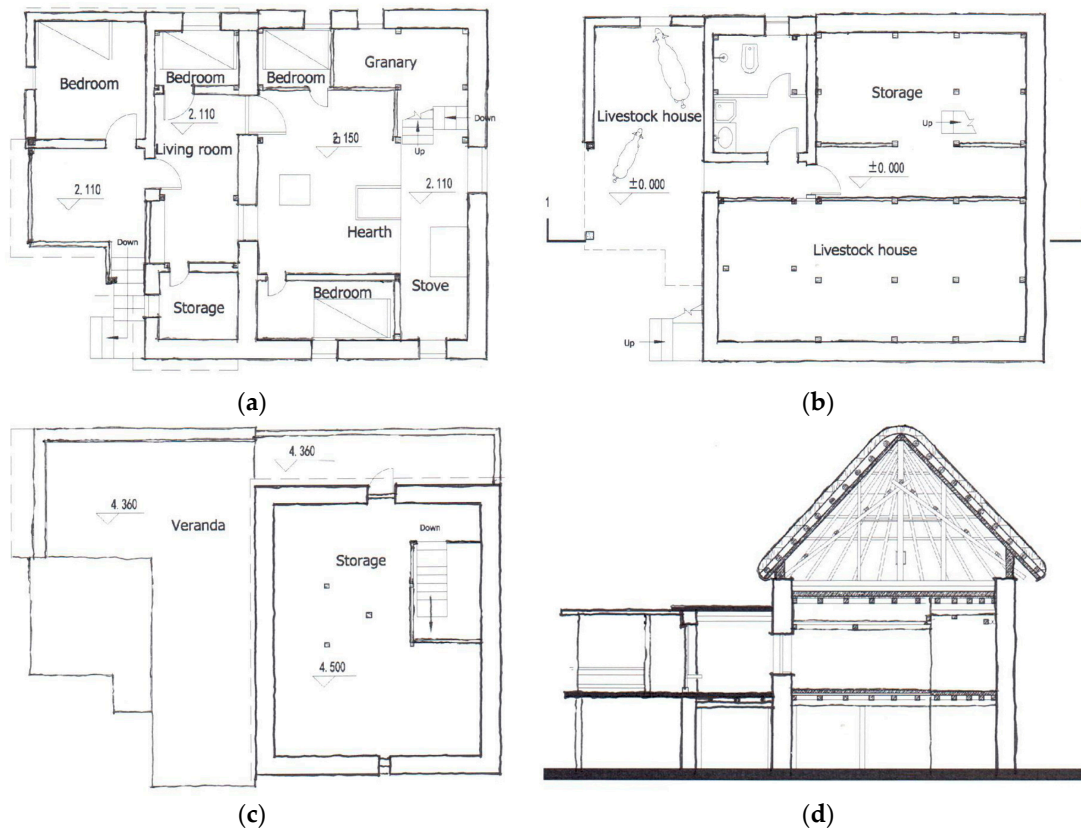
Plans and section of one Hani house in 2013: (a) Ground floor plan; (b) First floor plan; (c) Second floor plan; (d) Section 1-1.
